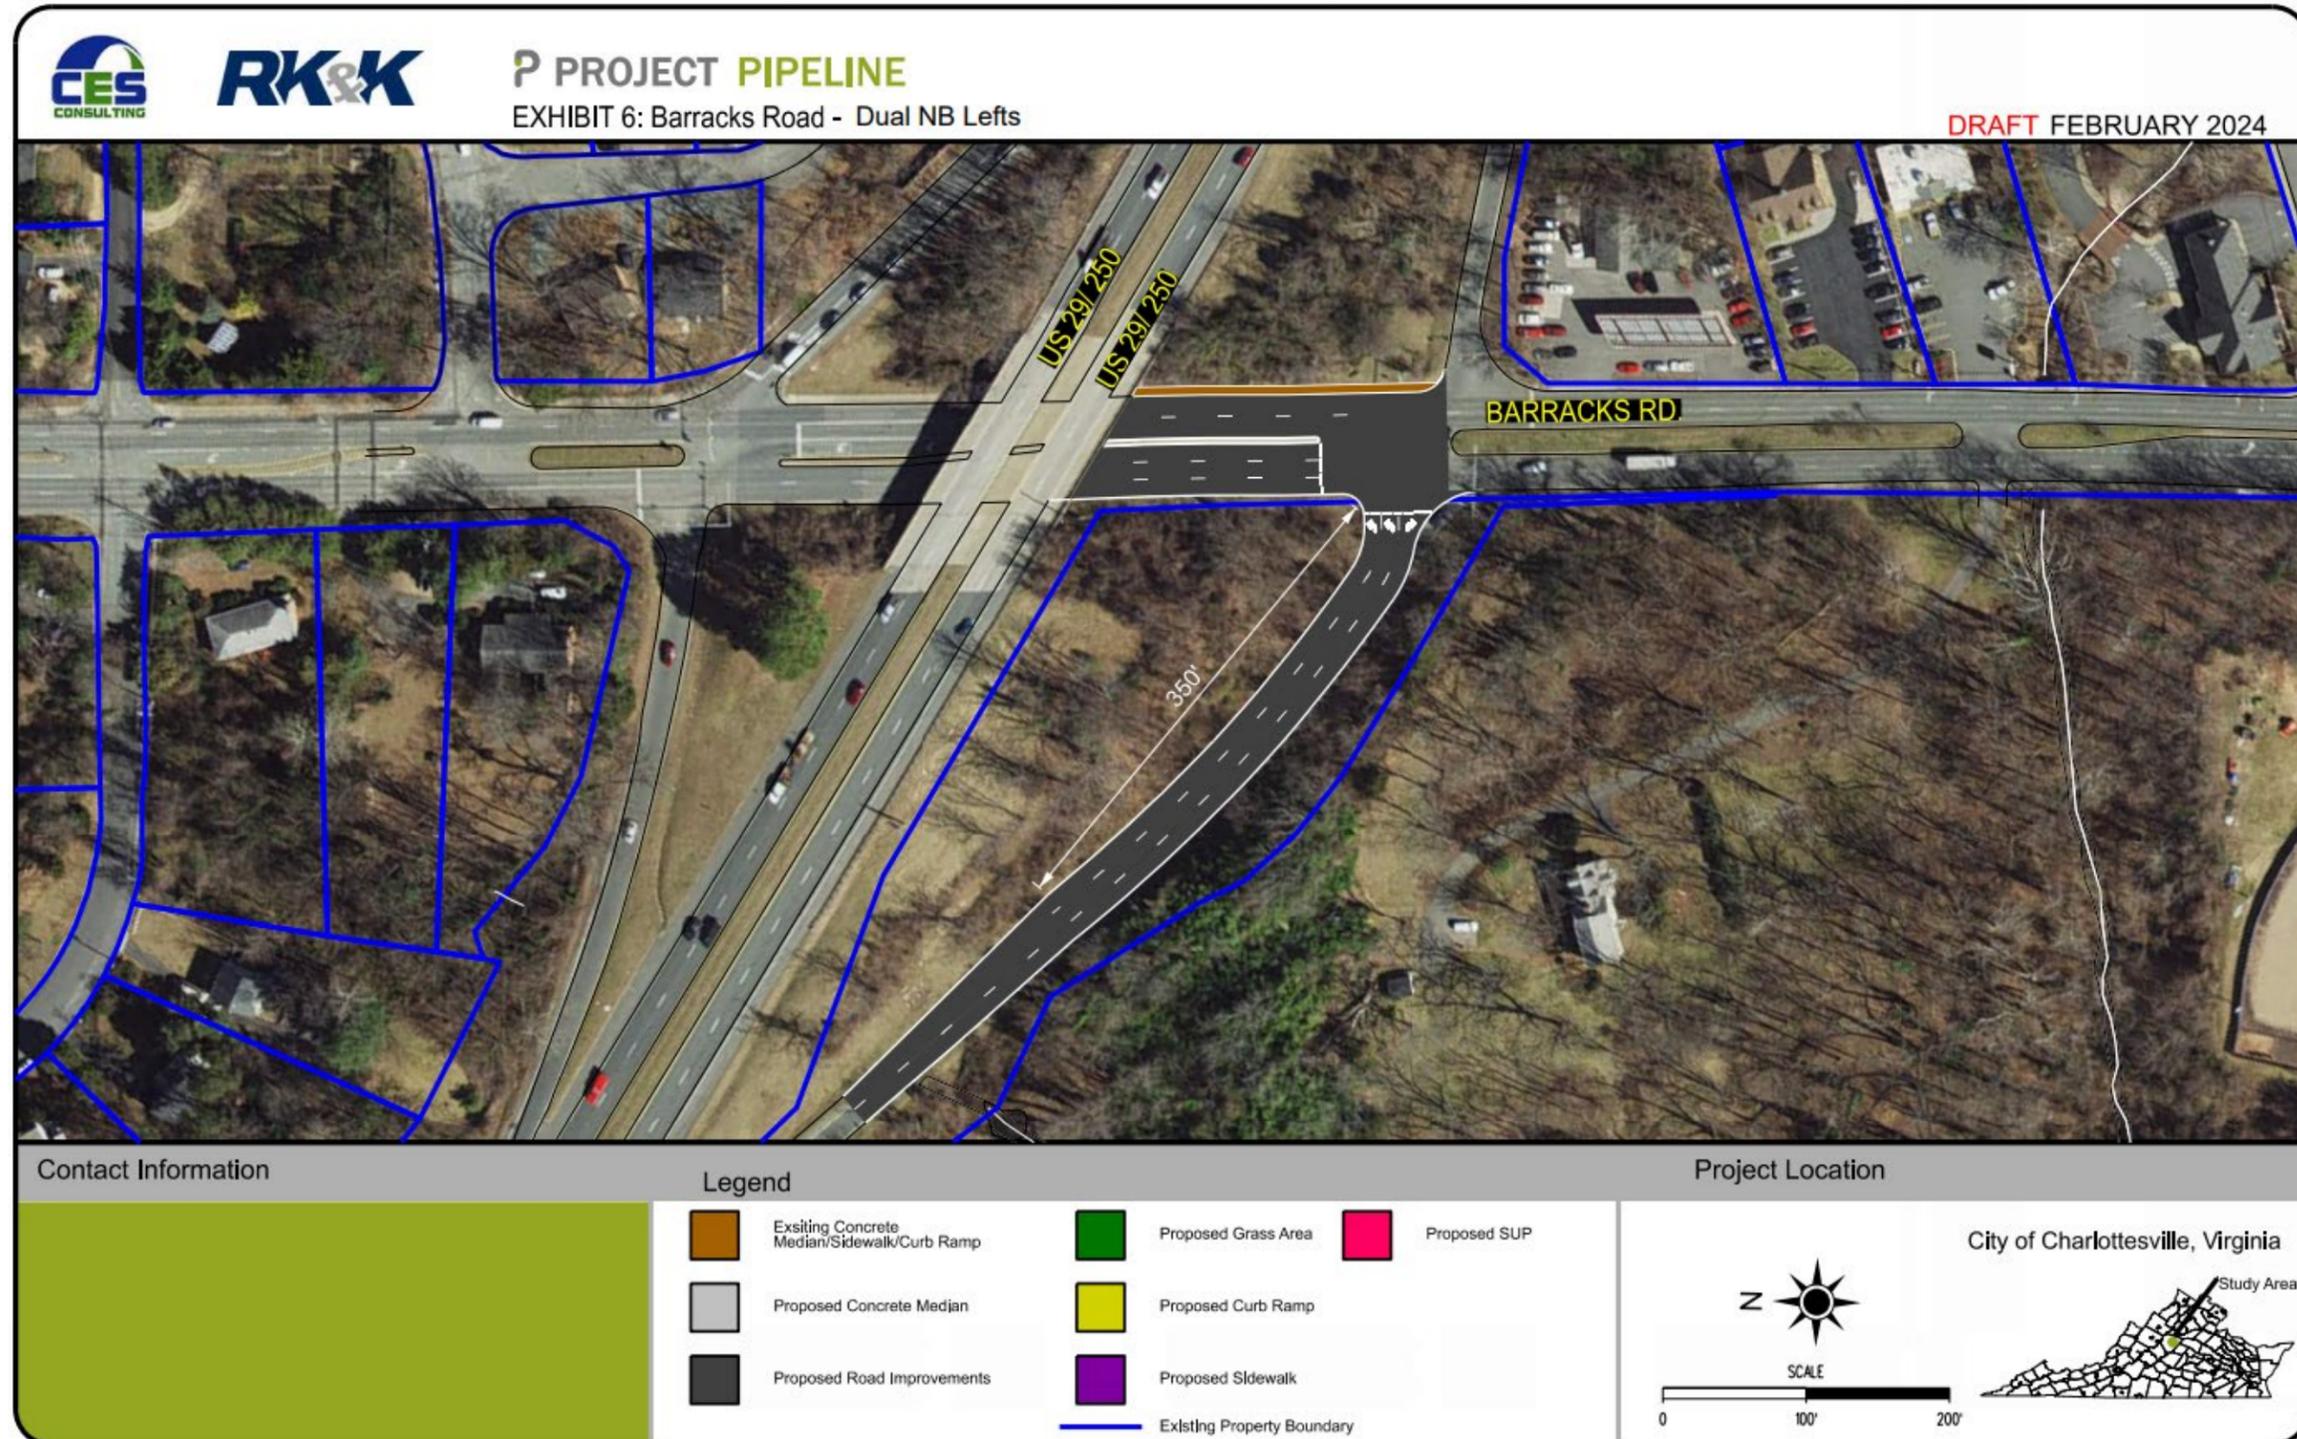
Barracks Road (Route 654) – Concept 7 (Segment 4)
